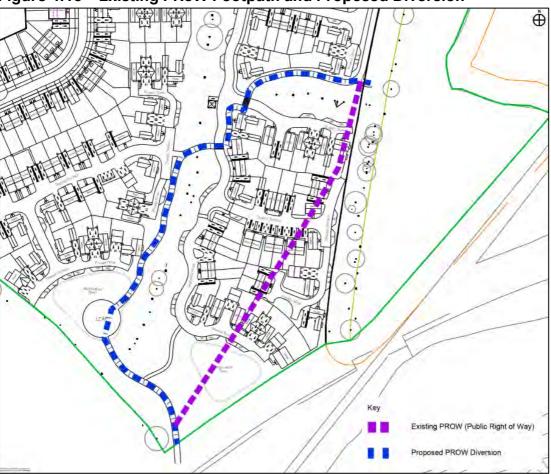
Existing PRoW Footpath and Proposed Diversion
